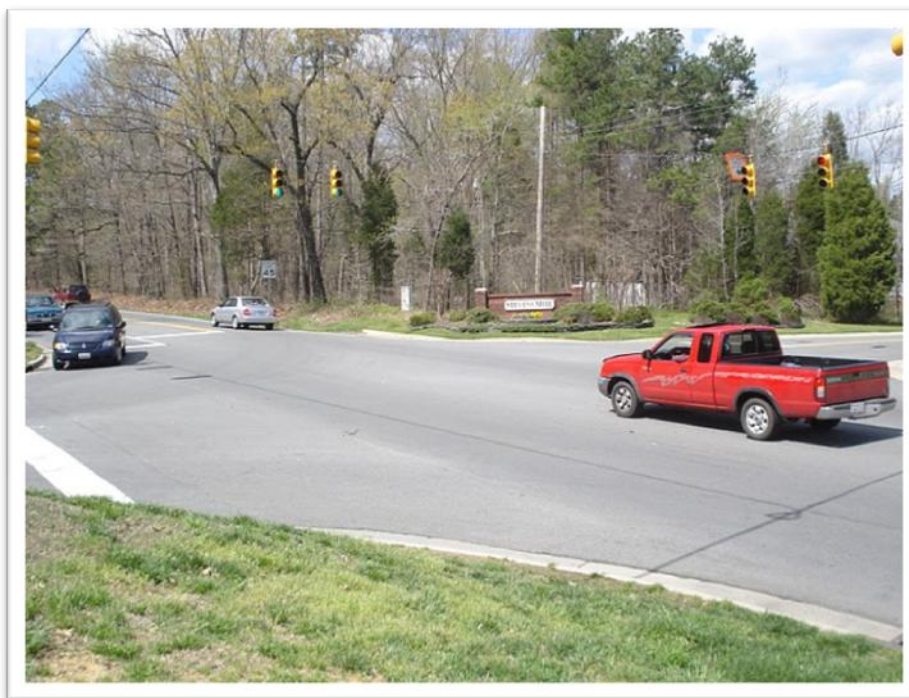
Intersection of Lawyers Road / Stevens Mill Road - The Bridges at Mint Hill Site, Charlotte
